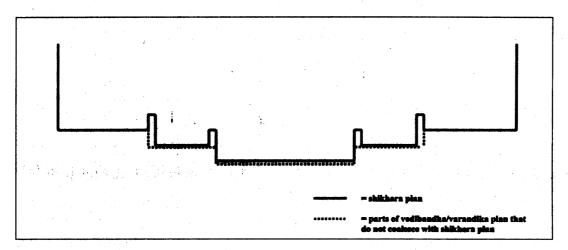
The vedtbandha plan from Temple 45 overlaid with its hypothetical śikhara plan.
